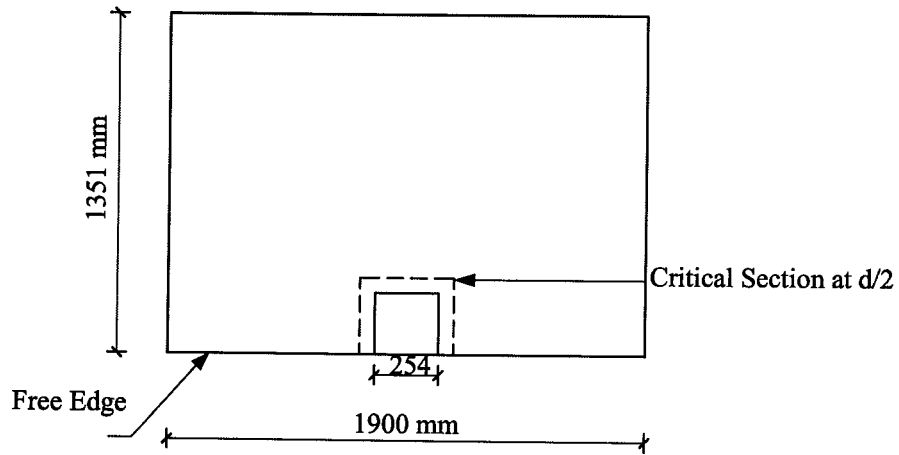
Plan of (Megally and Ghali (2000)) Test Specimen
